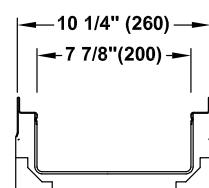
10" Wide 'Shallow' Trench Drains with Integral Metal Rail - SlabDrain®
